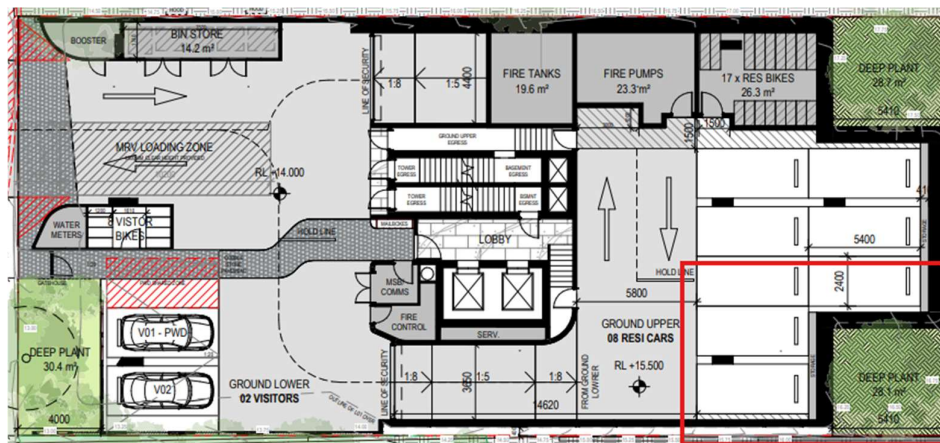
Previous ground level car parking layout (IR Response) (Source: Plus Studio, 2026)
